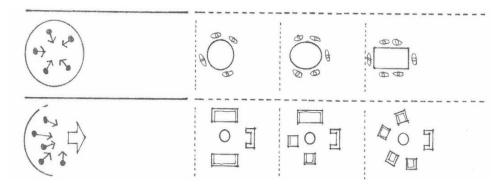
Possible Plan Arrangements for Living and Dining Spaces (Ching, 1987).
